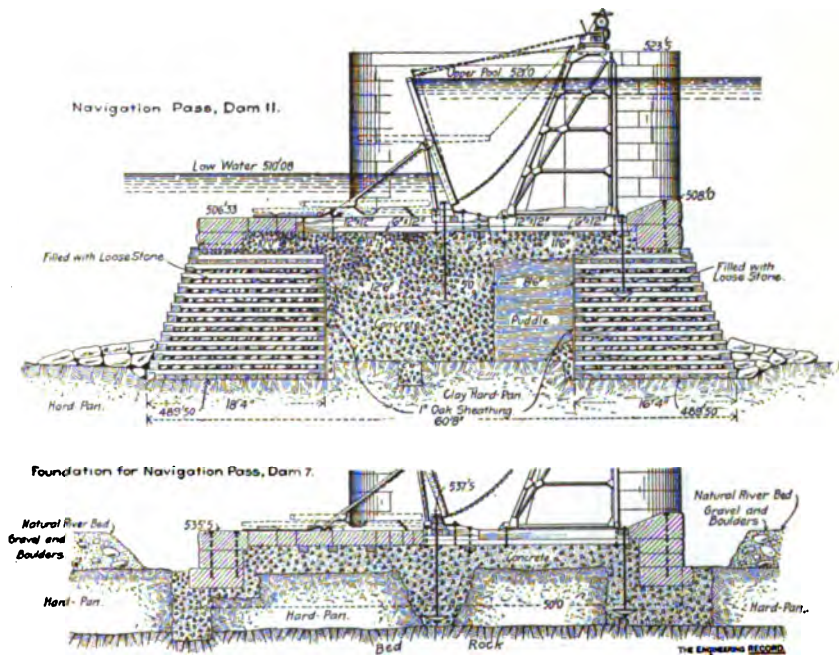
KANAWHA RIVER DAM FOUNDATION.
